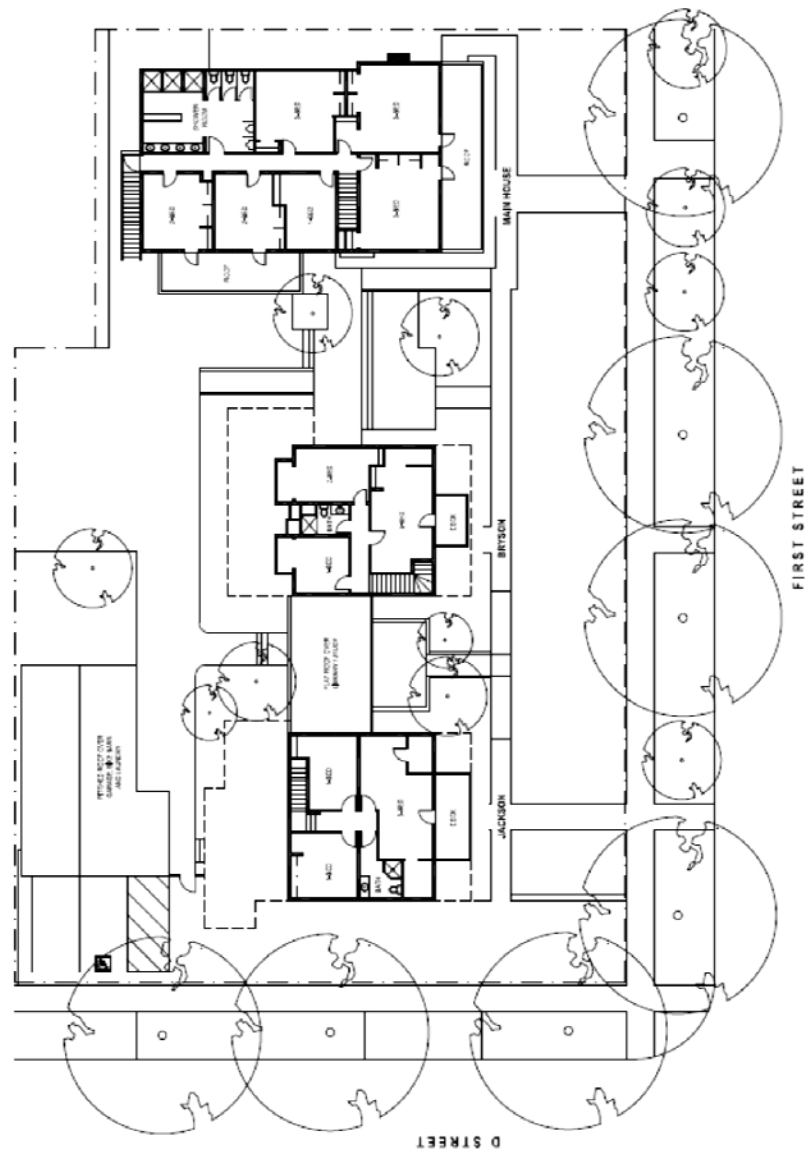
Theta Xi Fraternity existing floor plans -2nd Floor (courtesy Beta Epsilon Association of Theta Xi).
